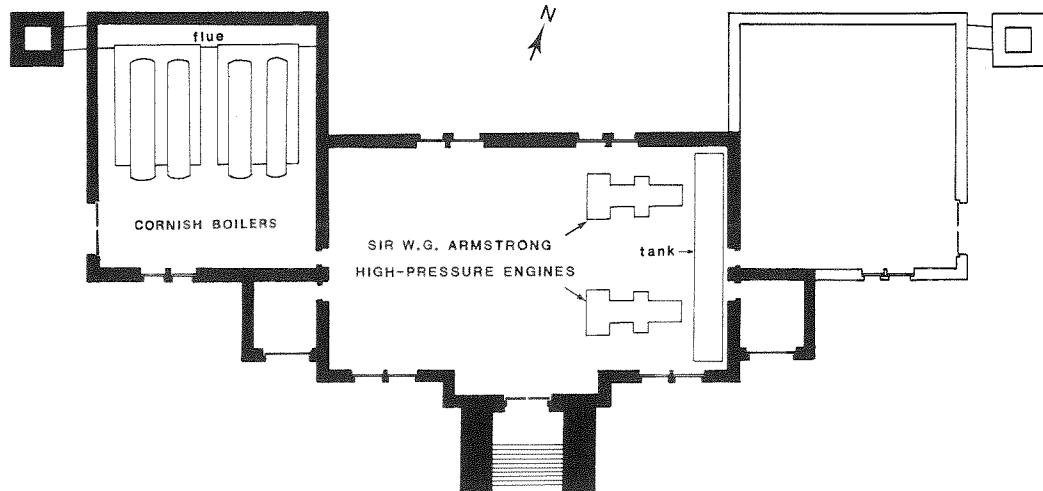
Plan of Bullock Island Hydraulic Power-House, 1st Extension, 1890. Adapted from New South Wales Railways Archives Plan No. E 14/605.
